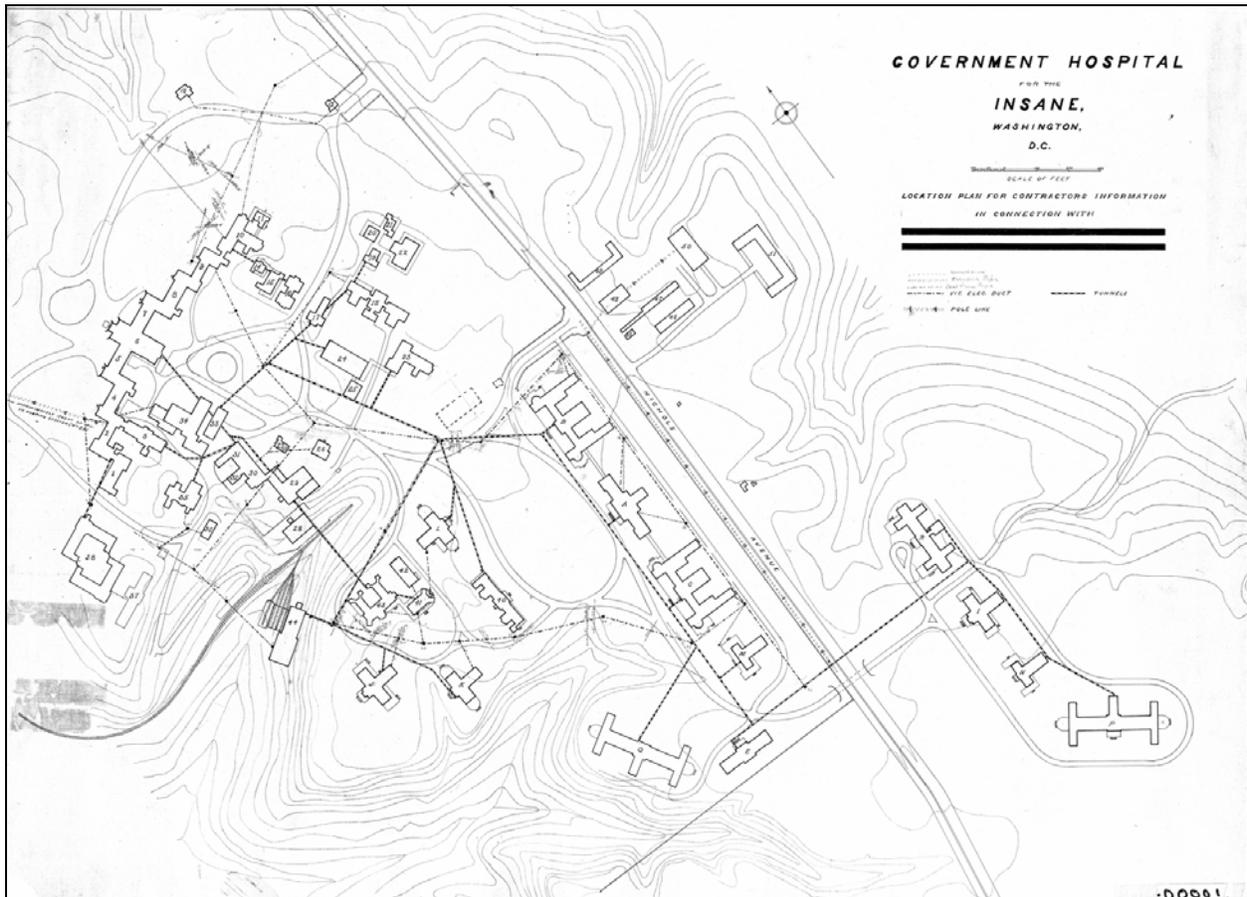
The 1910 “Government Hospital for the Insane” depicts numerous tunnels connecting the buildings at St. Elizabeths. Infrastructure on the West Campus increased with the construction of the new power plan in 1904. New tunnels were constructed to carry electrical ducts to the new hospital facilities. Courtesy National Archives II.
